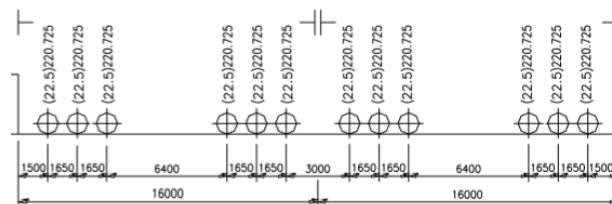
Loading Conditions With With Double Head 22.5t LOCO
